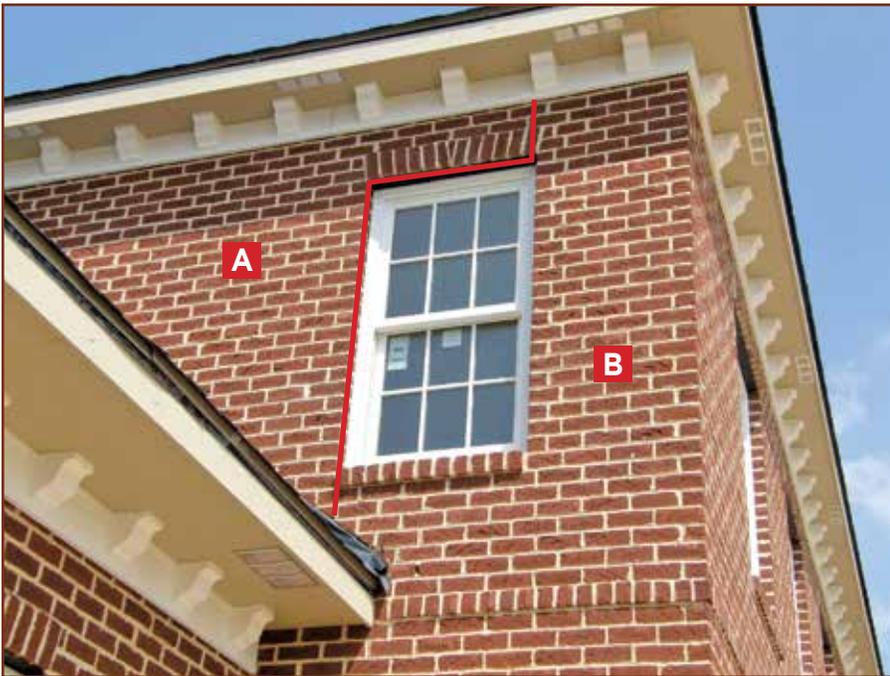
The red line denotes location of a crack due to lack of isolation joint between elevation segments A and B, which have different bearing conditions. Segment A bears on steel, and segment B bears on the foundation below.
